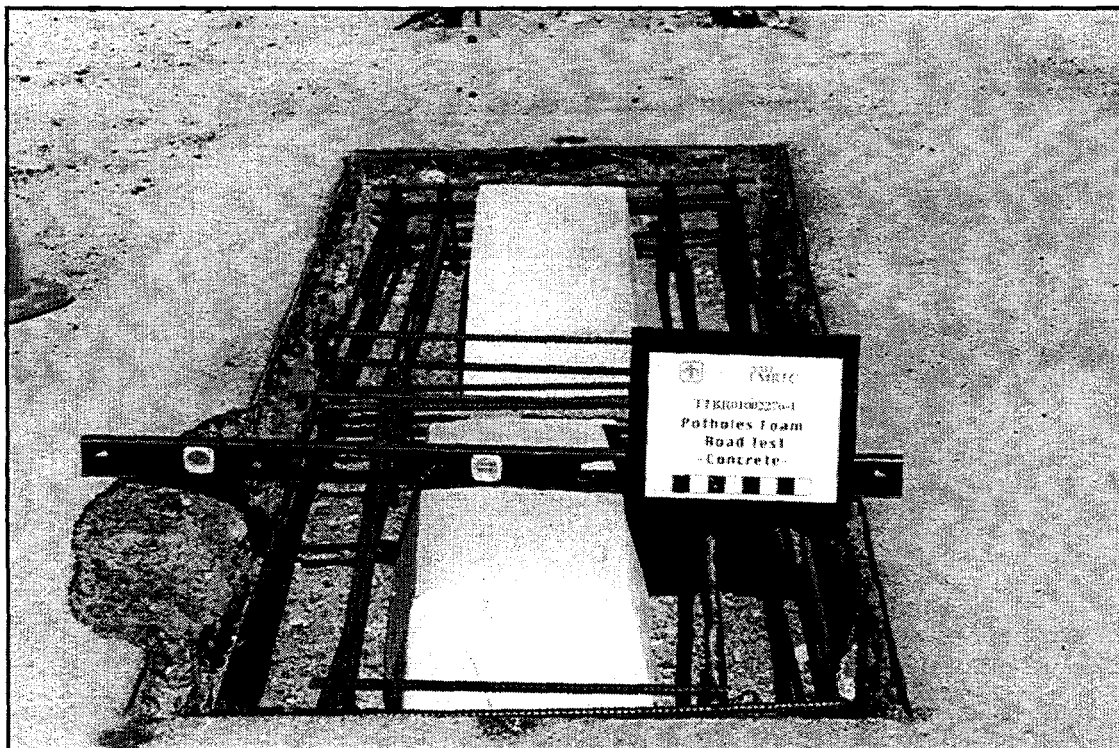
Concrete Road Experiment Hole (with reinforcing rods installed)
